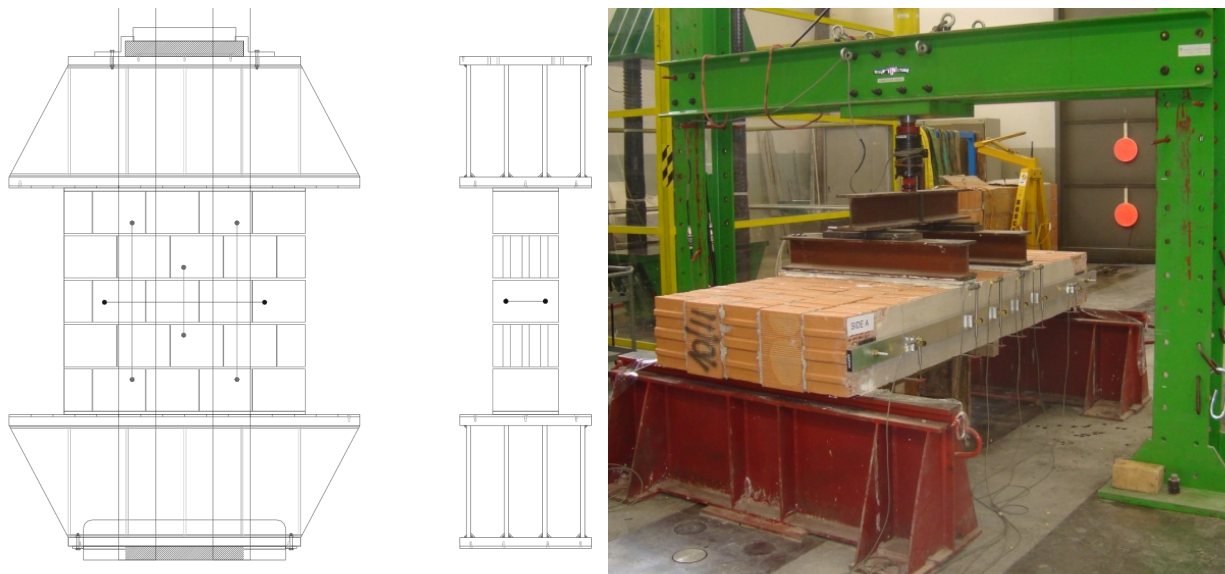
Examples of geometry and set-up of compression tests (parallel to unit holes, left) and bending tests (bed joints orthogonal to failure, right).
